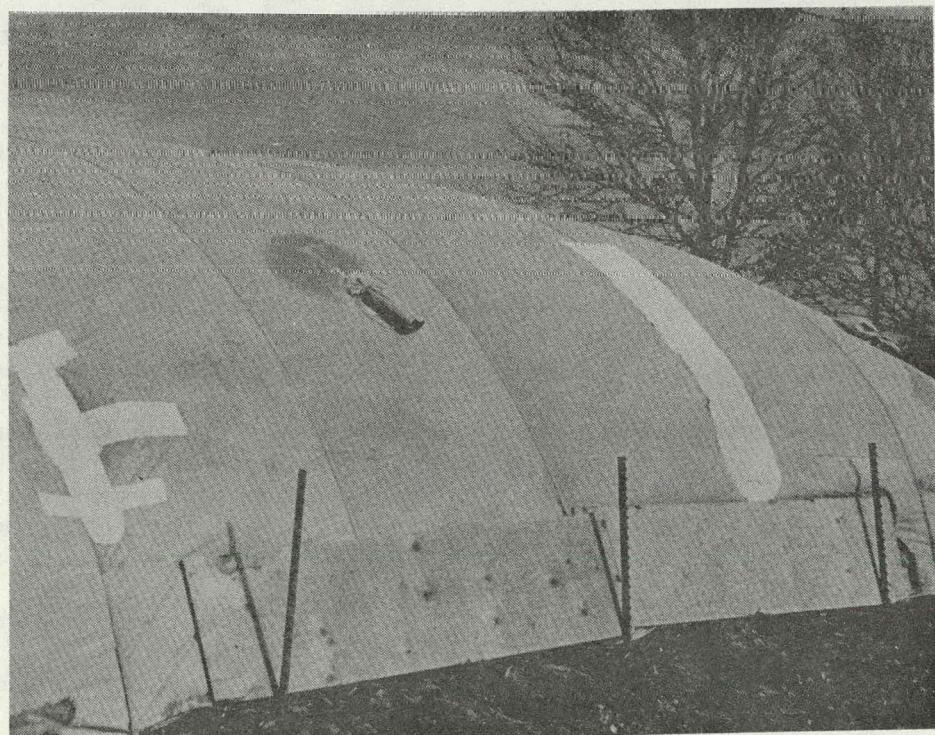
Outside of flat storage showing air ducts and plywood wall support.
